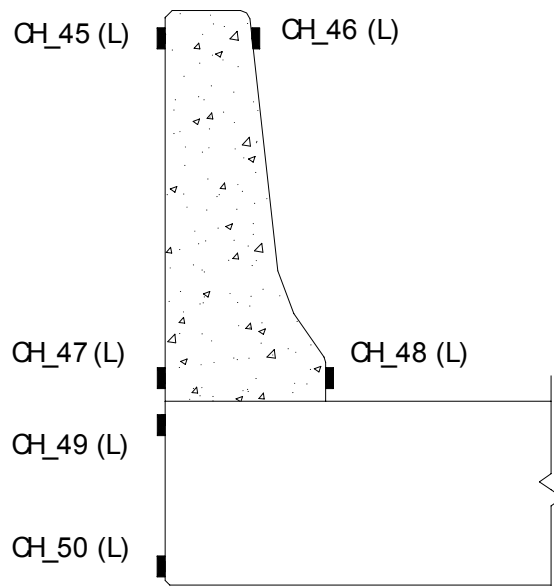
Strain gage plan of parapet (section is at midspan; L denotes longitudinal)
